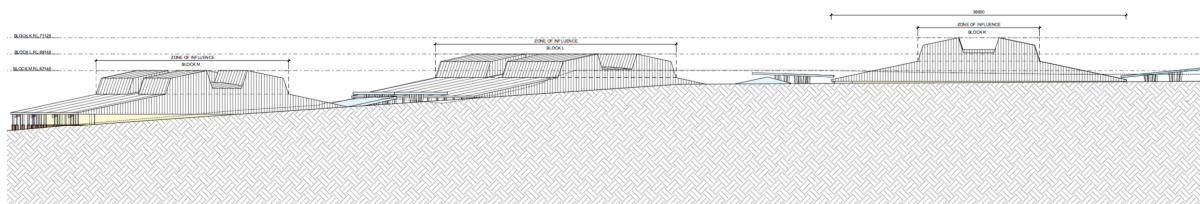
Excerpt from the northern elevation of the Junior School (drawing MP-JS-20-01). This elevation shows the extent to which the buildings are cut into the side of the hill.
